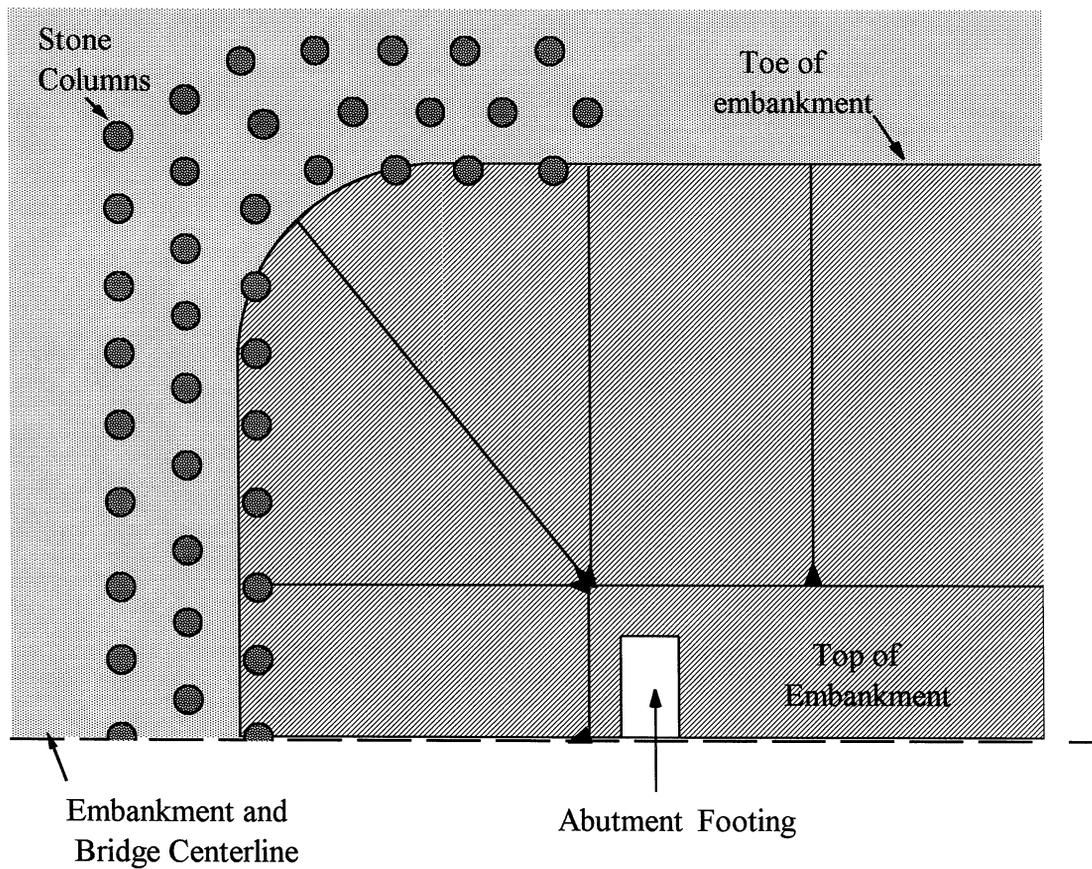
Vibro System (Stone Column) Treatment Around a Pile-Supported Bridge Pier (after Jackura and Abghari, 1994)
